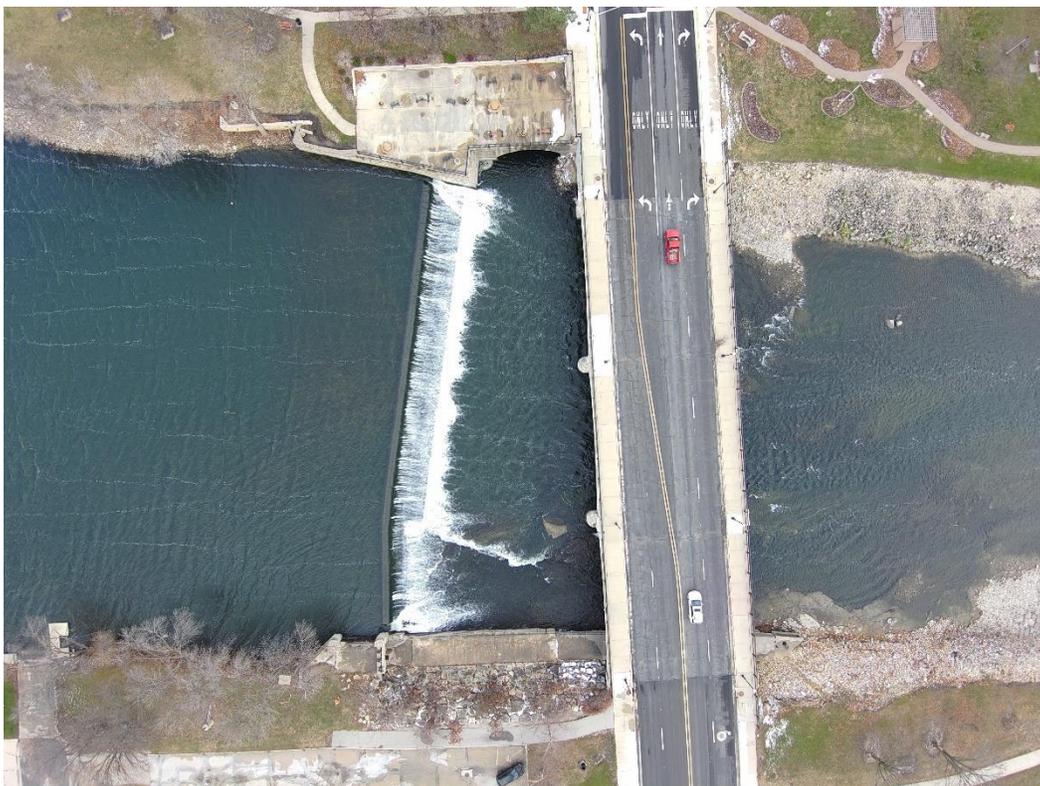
SITE PLAN VIEW LOOKING TOP NORTH
